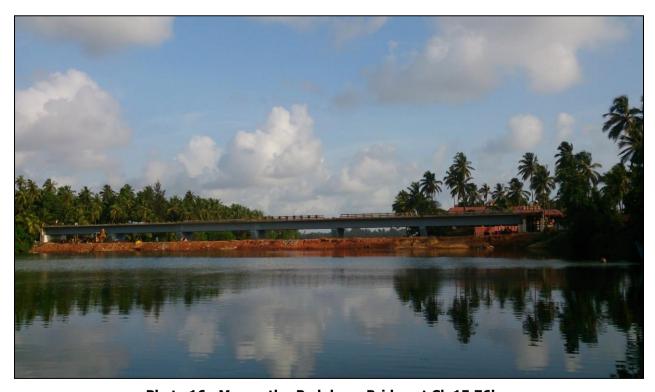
Marvanthe-Padukone Bridge at Ch 15.76km
